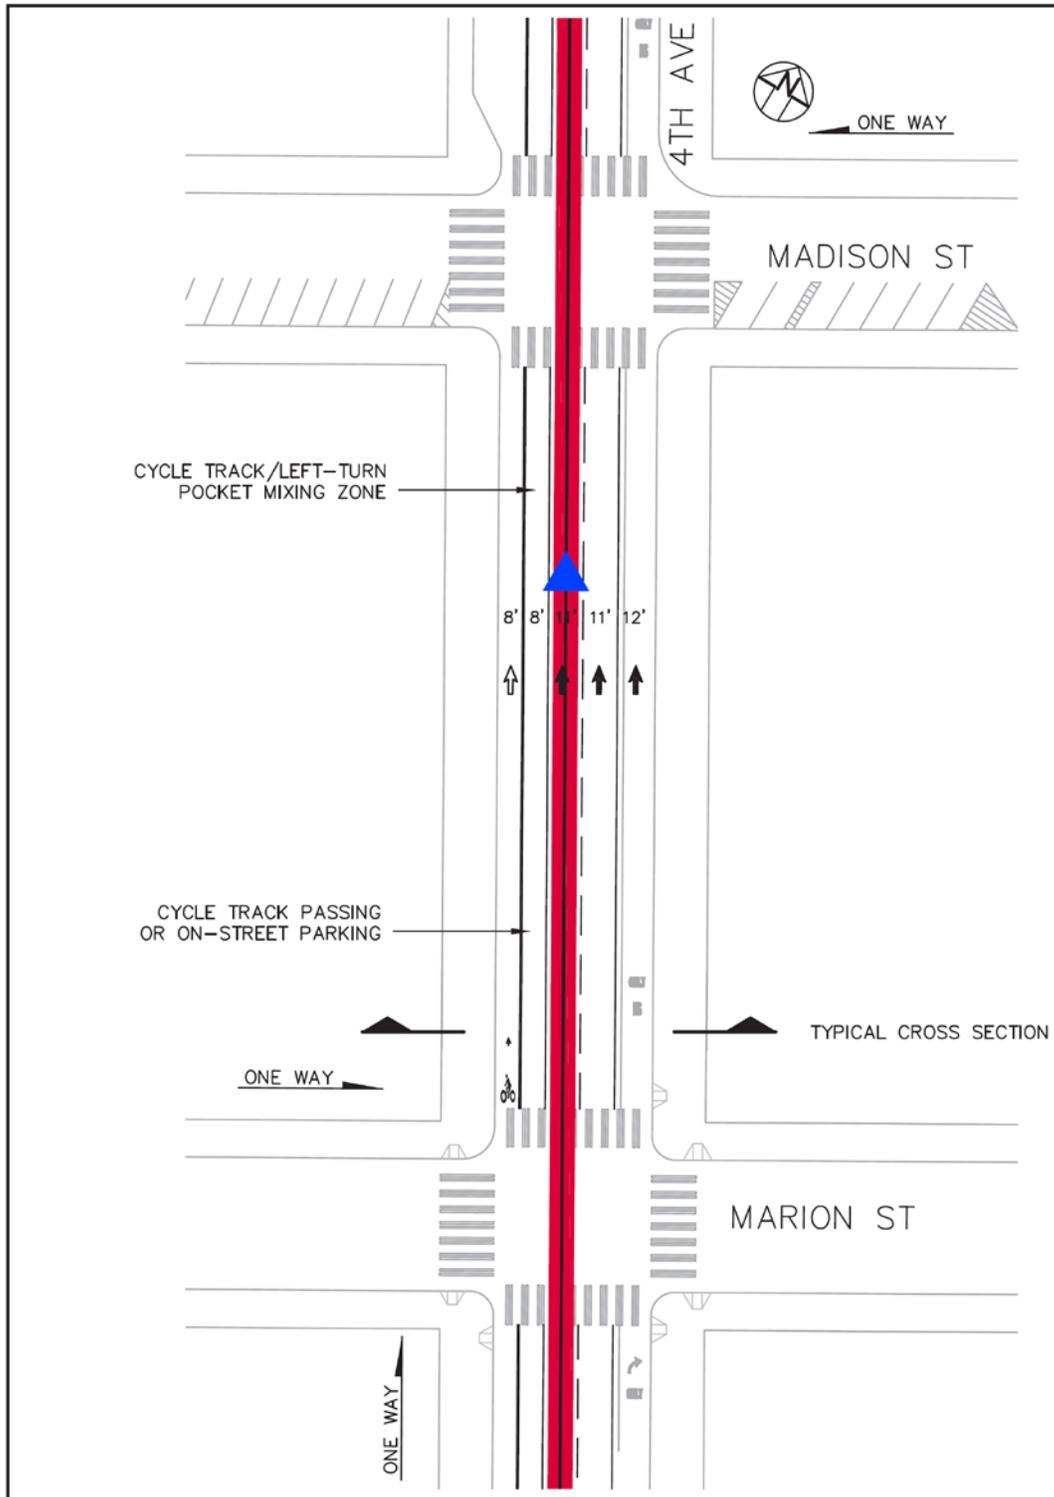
4th Avenue Mixed-Traffic Plan Diagram between Stations (Marion-Madison)
